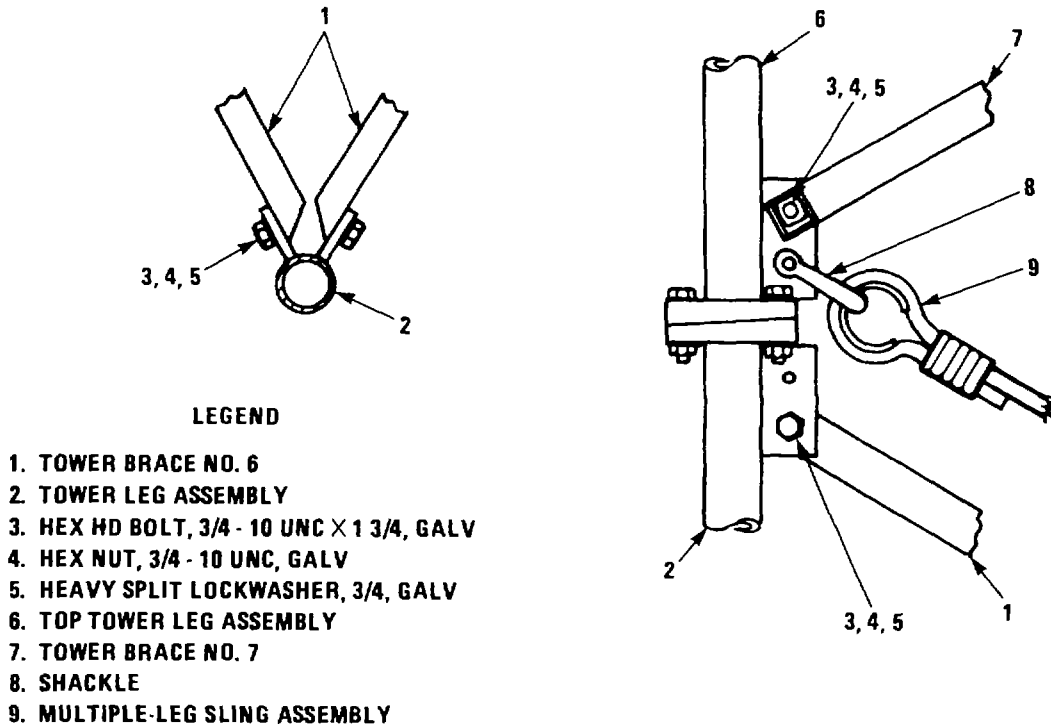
Brace Attachment and Multiple-Leg Sling Assembly Connection
